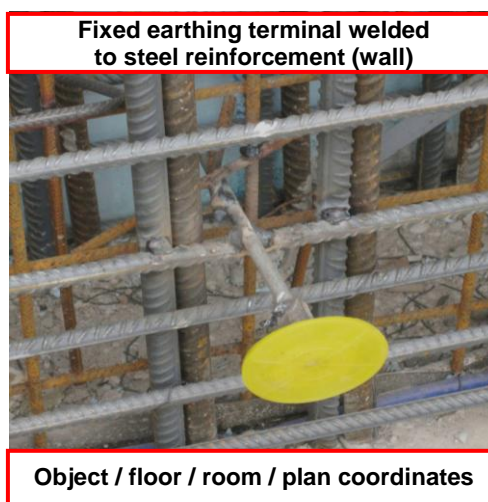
Documentation example for a fixed earthing terminal welded to the steel reinforcement
